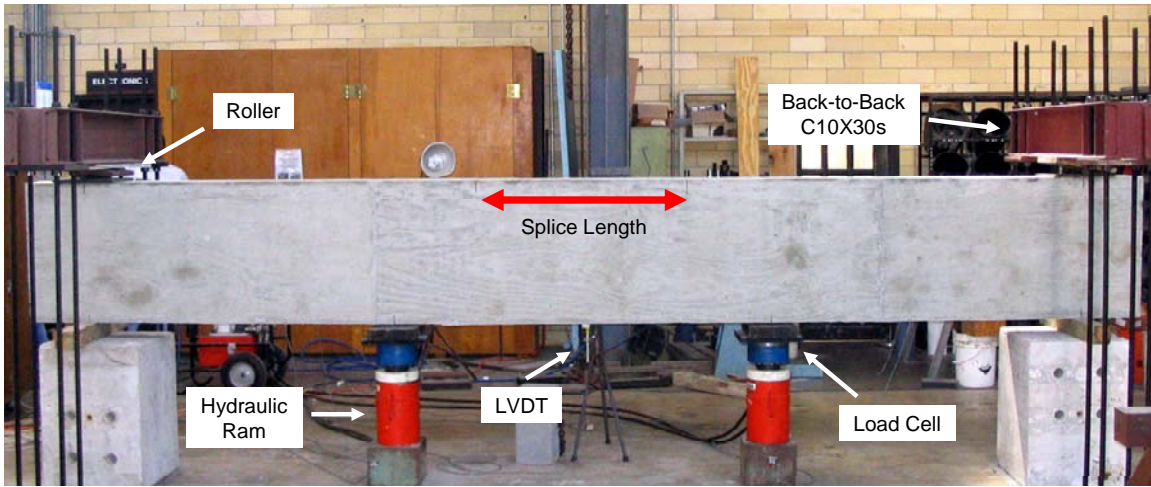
Typical laboratory test setup for narrow splice specimens
